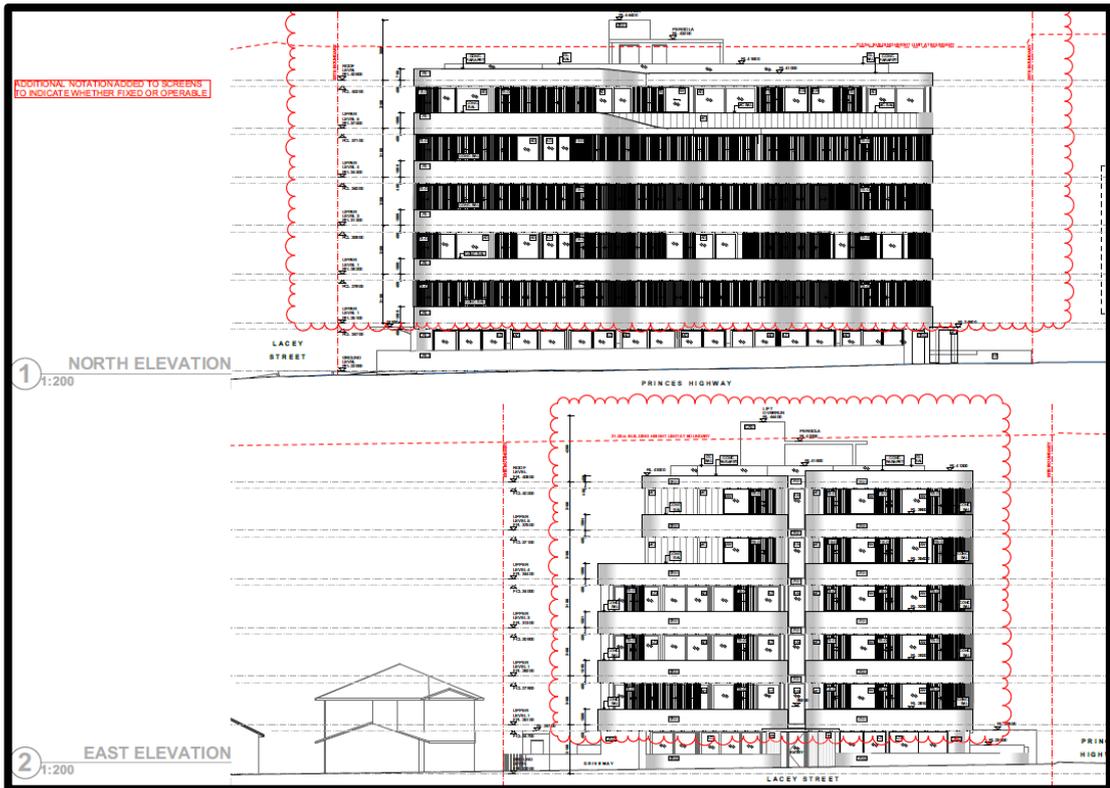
Extract of Elevations indicative height of building breach (Source: Bureau SRH, 2021).
